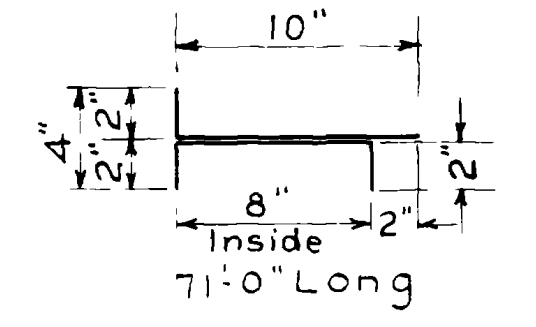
DETAIL OF DRAIN BOX No. 1 AT ABUTMENT BACKWALL
